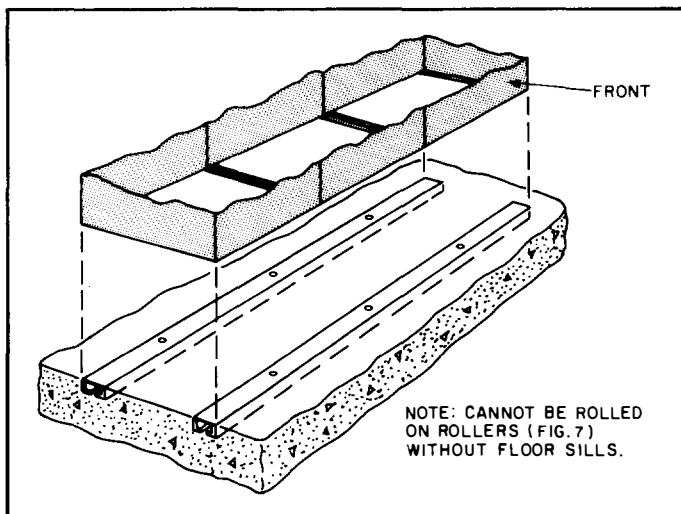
Control center floor sills grouted to floor prior to installation to provide level foundation.
